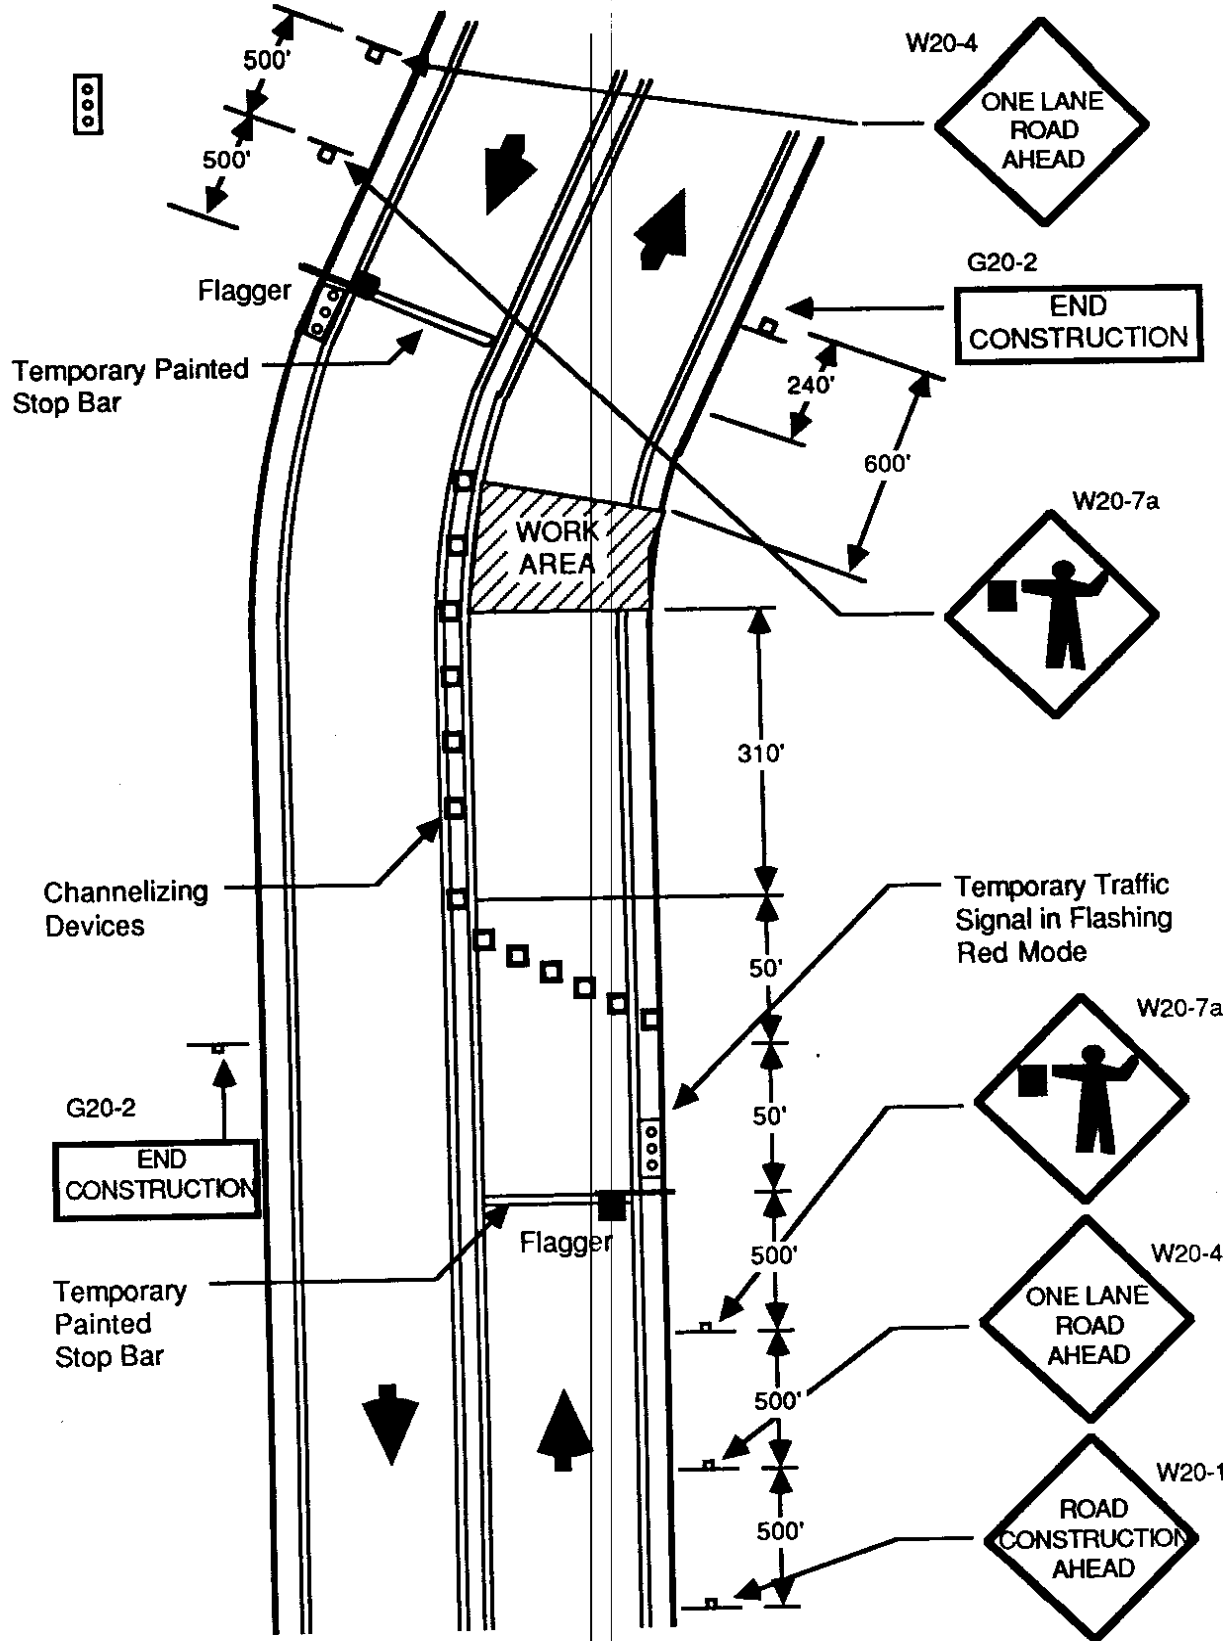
Traffic Control Plan Used for Flagger Aided with Flashing Red Light Controlled Two-Lane Highway Work Zone
